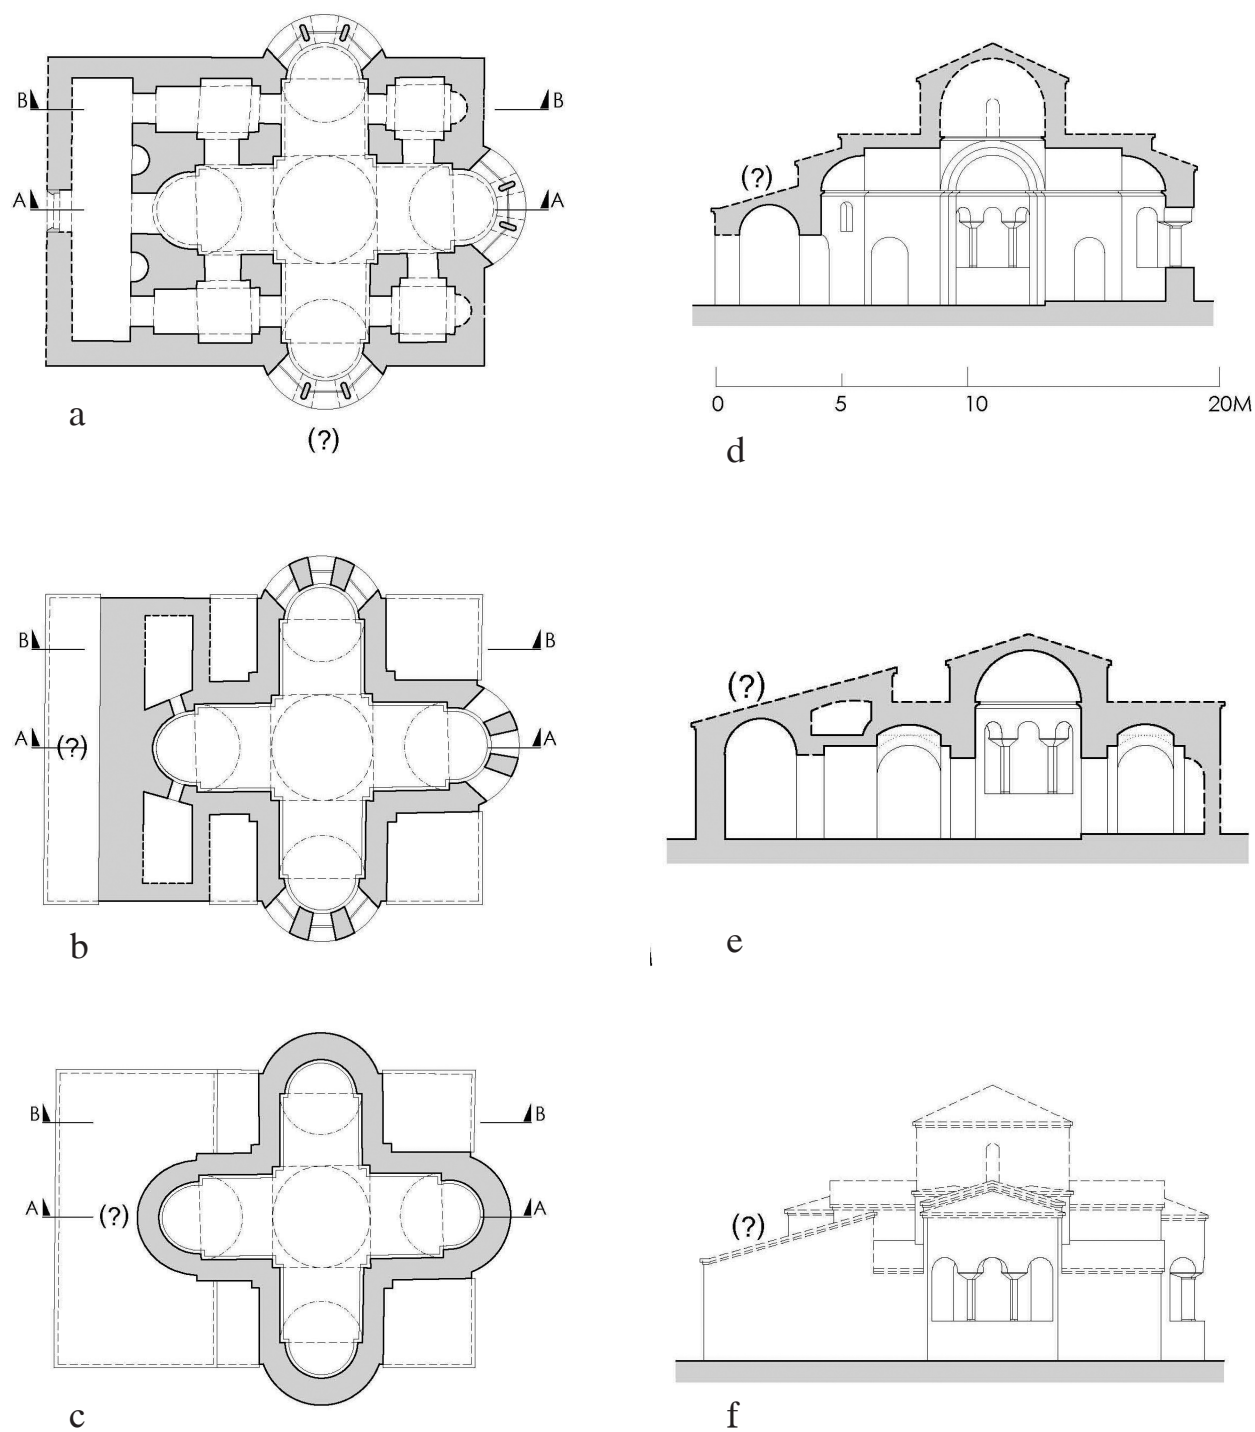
Apollonia Lake. Monastery of St. Constantine. Katholikon. Reconstruction. (a) Plan A, (b) Plan B, (c) Plan C, (d) Section AA, (e) Section BB, (f) South elevation.
